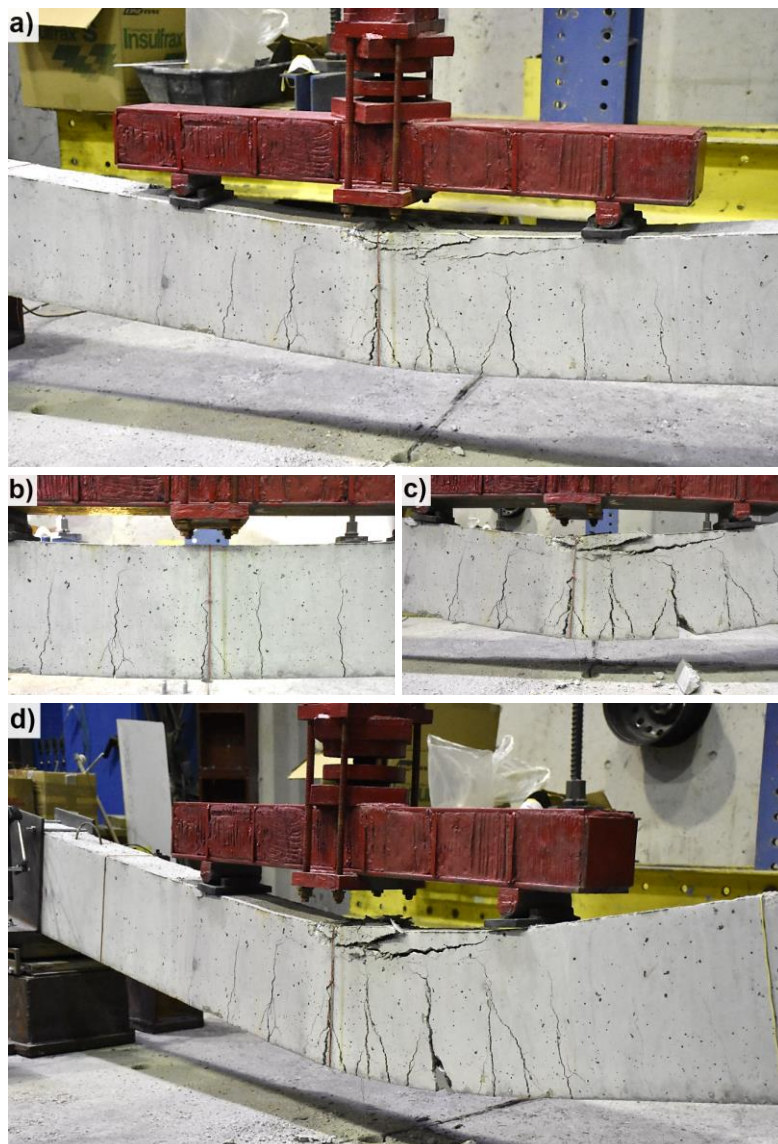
Failure aspects of the RC beam a few instants before collapse: (a, b) deformed shape with initial cracking signals and deflection; (c, d) deformed shape with excessive deflection and cracking, partial loss of concrete cover and concrete crushing in the compressed zone of the beam
